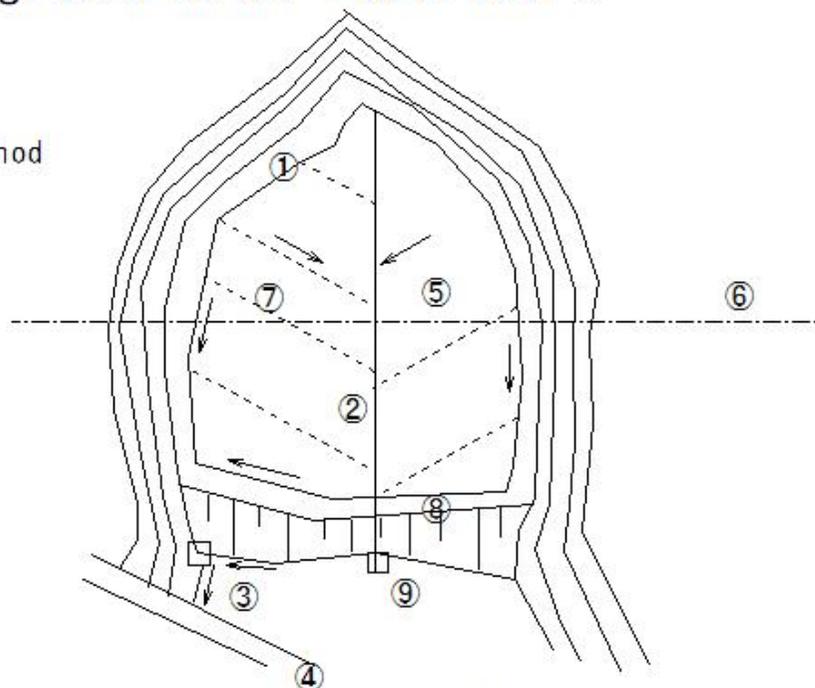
Example of layout of underground drainage facilities (plan view)
